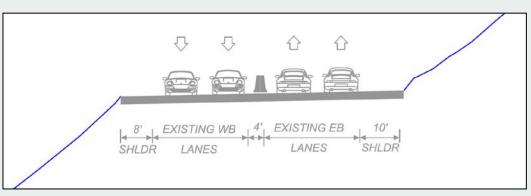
Typical Section of Existing Conditions Section 1 – East of Wyomissing Boulevard Interchange
